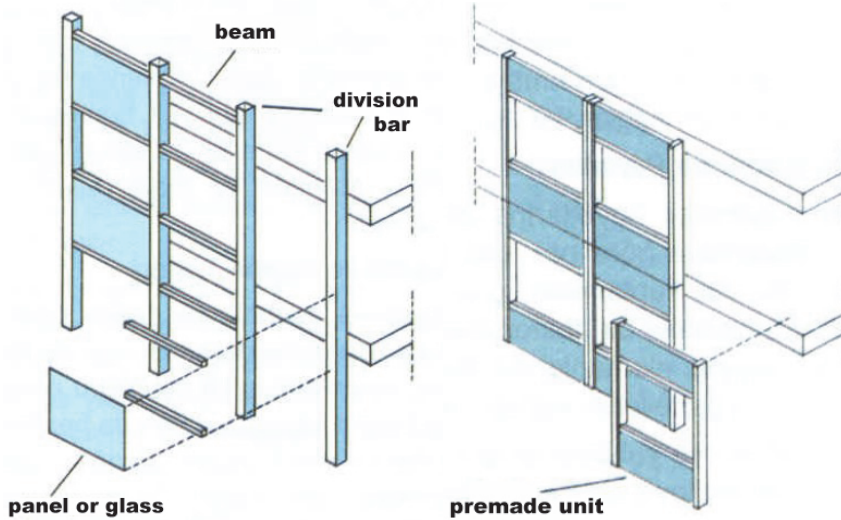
Stick Curtain Wall System on the left, Half Panel System on the right (Candemir, 2002).
